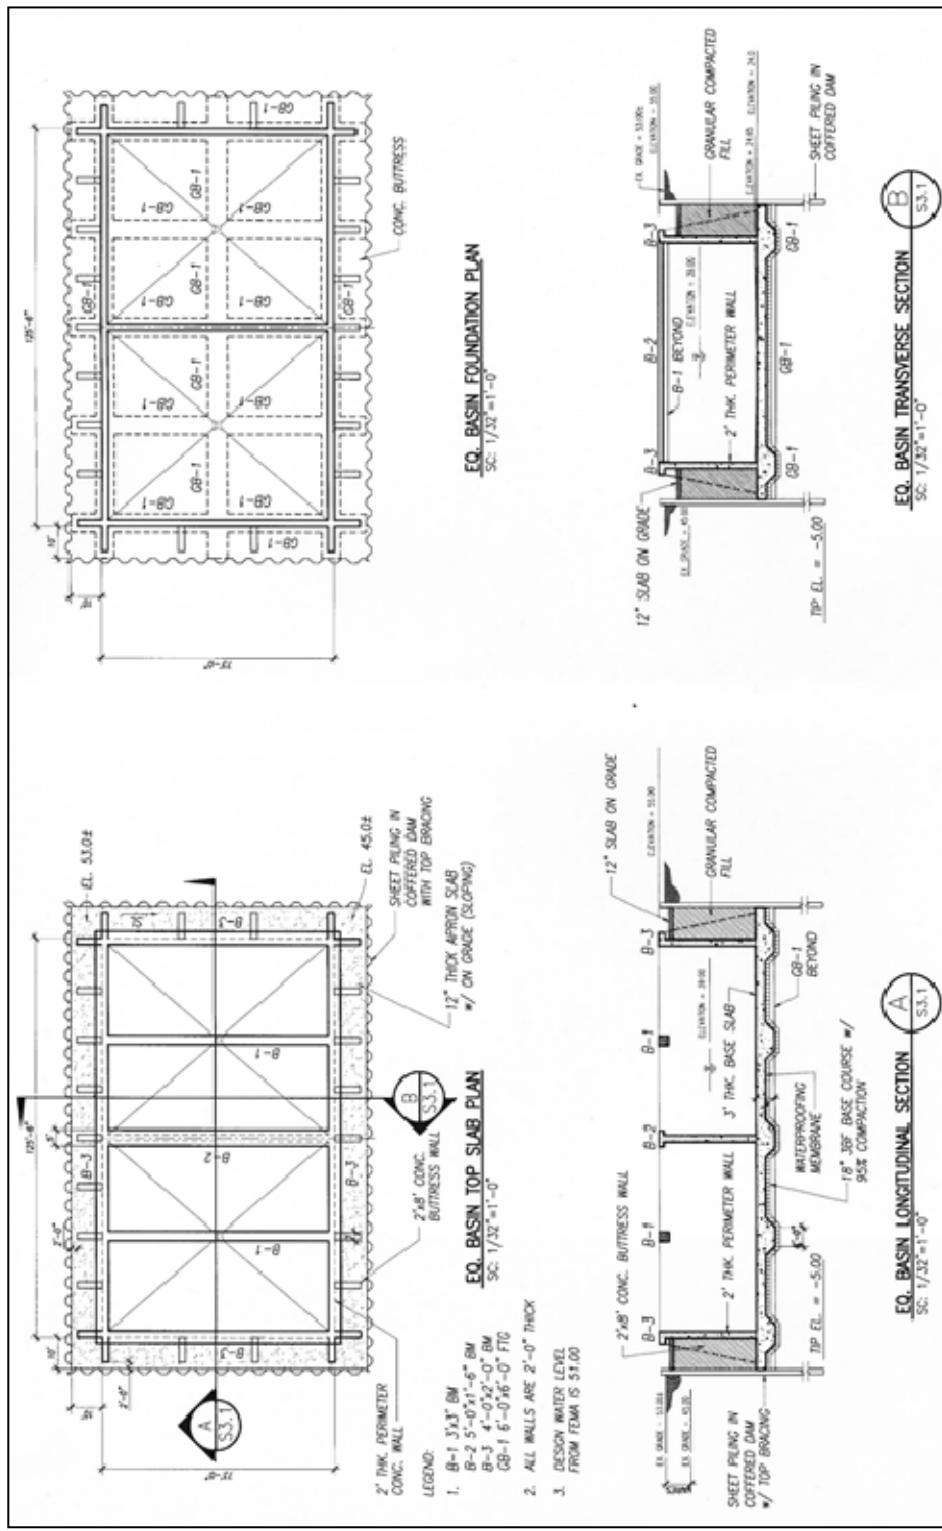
Option 3A: Structural Foundation – 0.84 MG EQ Basin at Site of Ex. Storage Tanks
